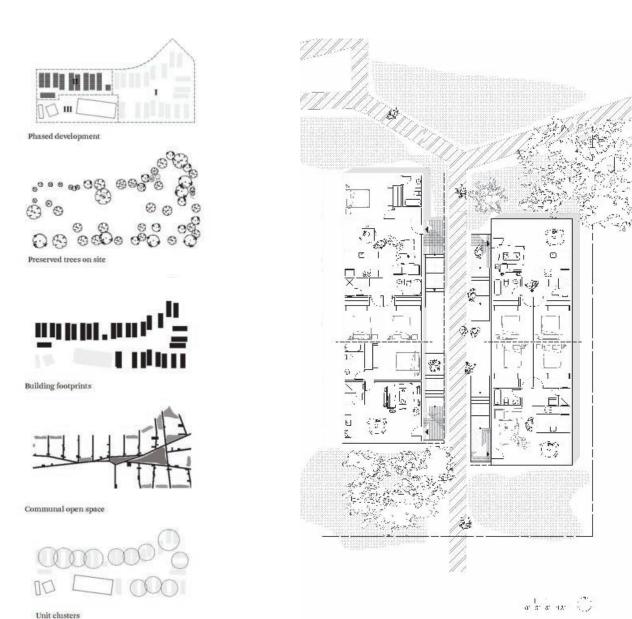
Developemnt and Floor Plan(Archdaily, 2019)
